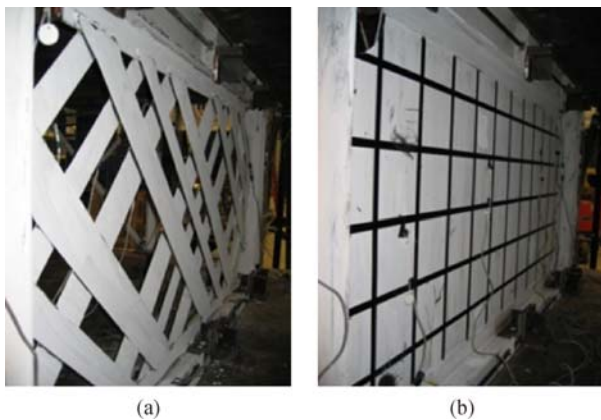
UB third-scale specimens with (a) strip infill and (b) full infill web plates
